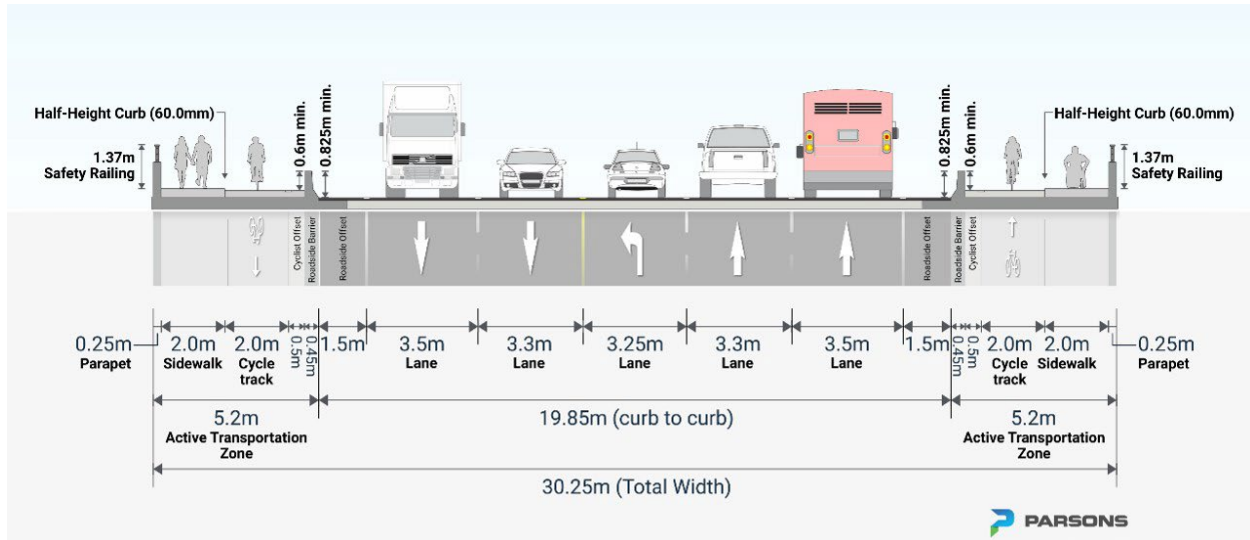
Recommended cross-section for Huntmar Drive Complete Street Bridge
